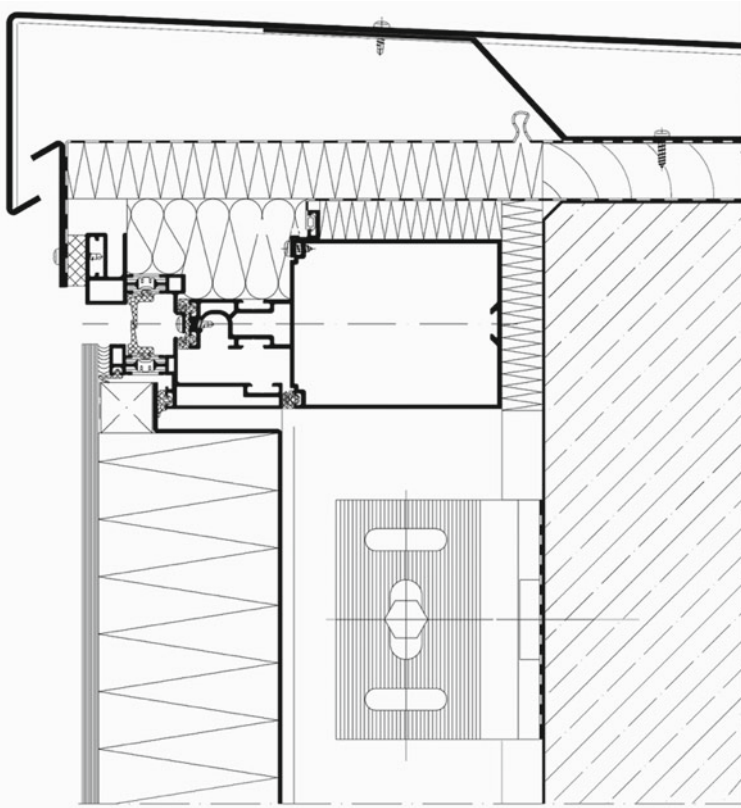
Assembly of the structural façade system to the roofing structures that involves the connection by means of the “π” brackets (aggregated to the perimeter surfaces), the application of the spandrel panel (with cladding sheet and heat-insulating layer) to the upper transom according to the attachment of the outer sheet to the laying profile. © Courtesy of Schüco
